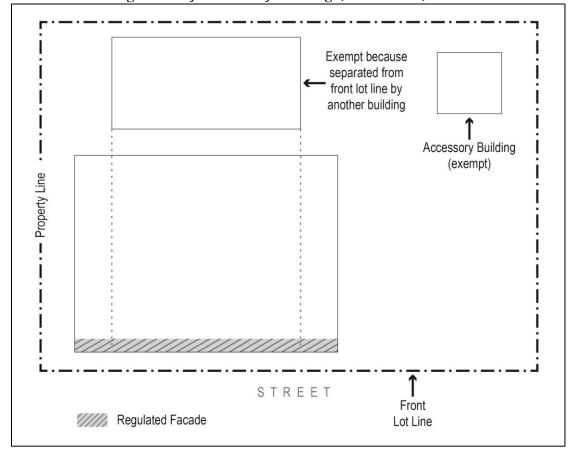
Regulated façades for Façade Design, Articulation, and Window Standards.
